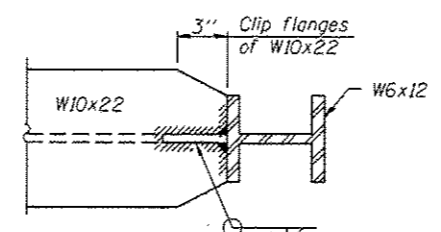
DETAIL B - ALTERNATE BOLTED W10x22 TO W6x12 CONNECTION
